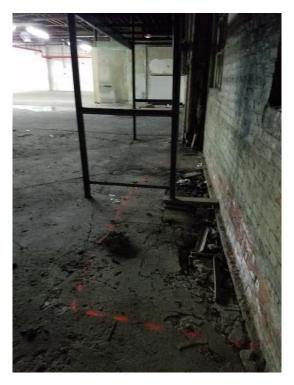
View of the damaged concrete slab in the southwestern portion of Block 4384, Lot 36 (facing east)
